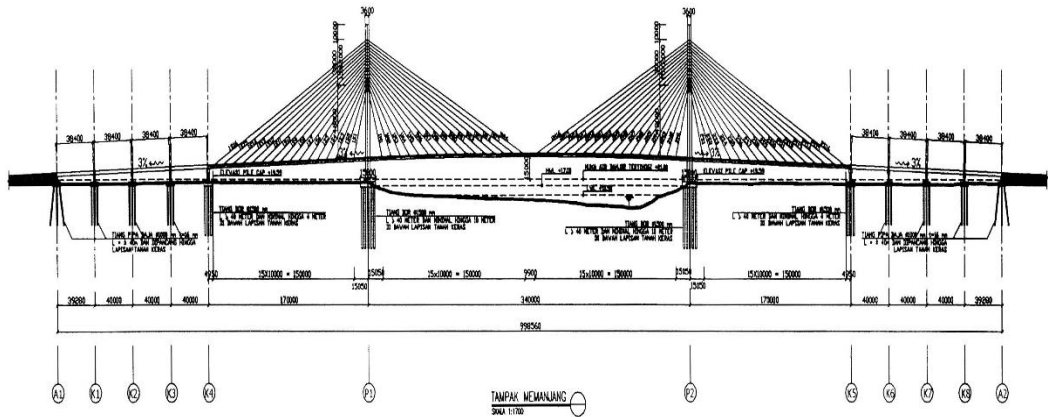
Longitudinal cross section of Tulur Aji Jangkat Bridge at Melak, East Kalimantan
